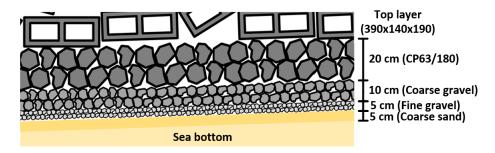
Side view of a block reef strip with top layer: 390x140x190 mm
